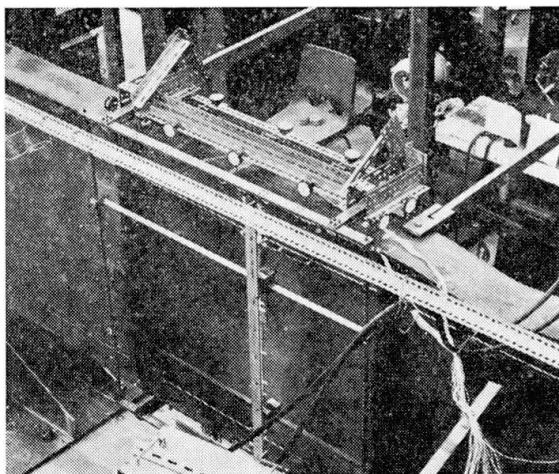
View of Central Bay of girder showing deflection measuring apparatus.
